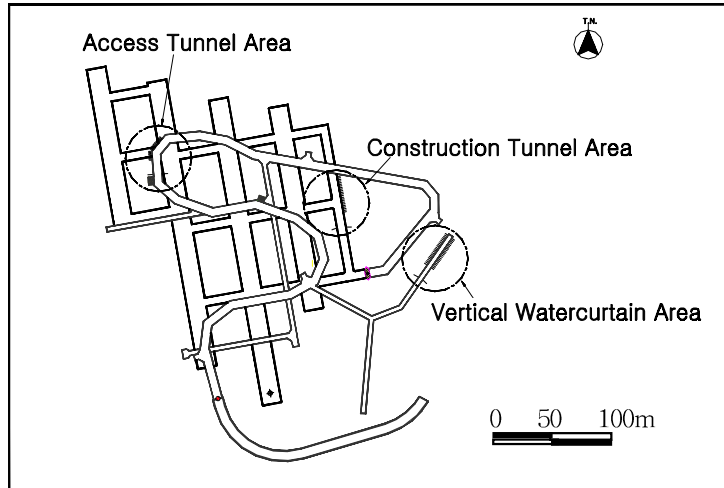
Location map of TSP survey. Survey configurations were arranged in access tunnel, construction tunnel and watercurtain tunnel. The slope of access tunnel is 12% and, the slopes of construction tunnel are ranged from 12.2% to 13.3%. Watercurtain tunnel is horizontal.
